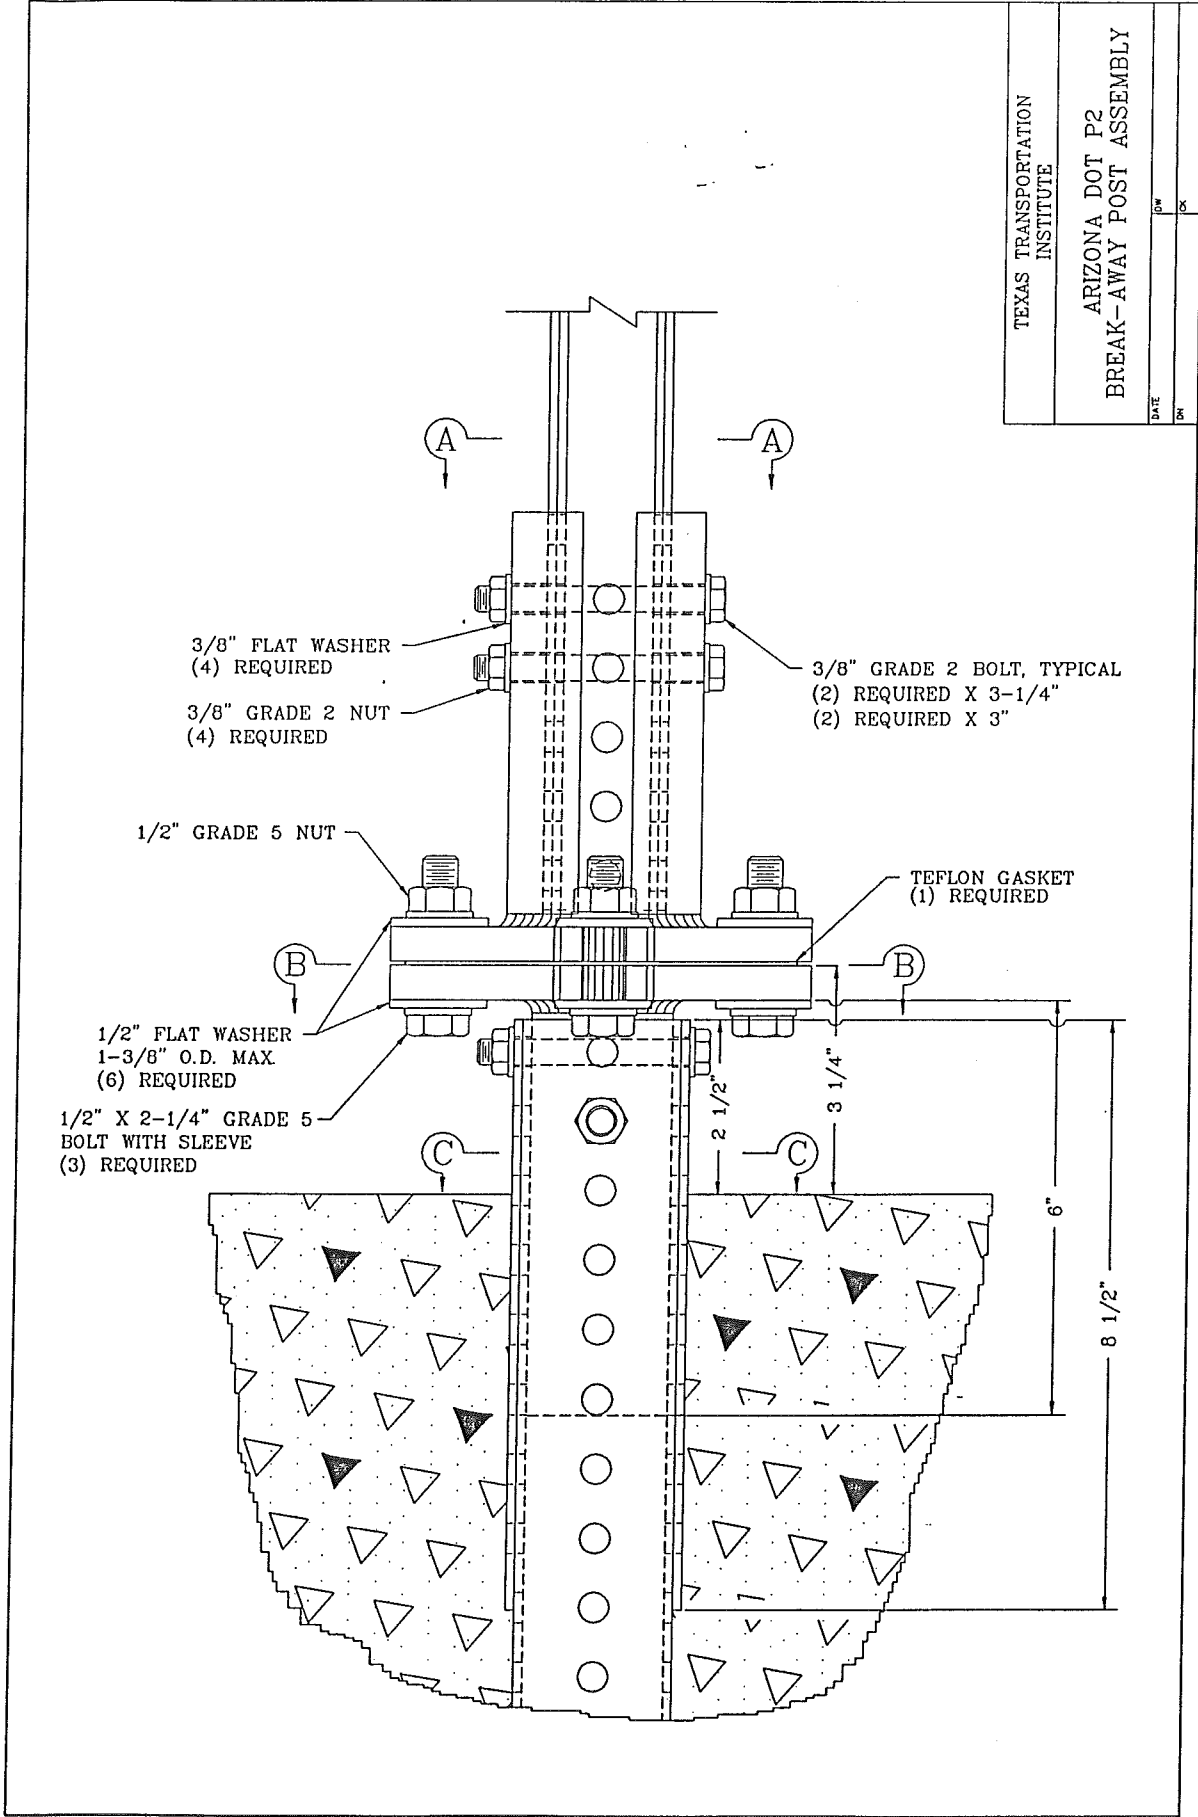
A. DETAILS OF SIGN INSTALLATION FOR TEST 7024-29 AND 7024-30
